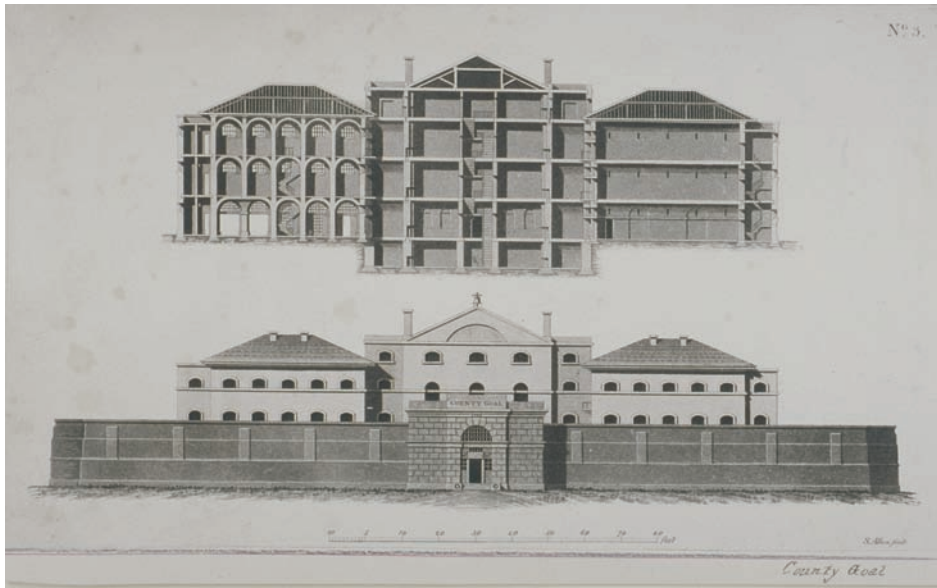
Elevation and section of Coldbath Fields House of Correction, 1800.
